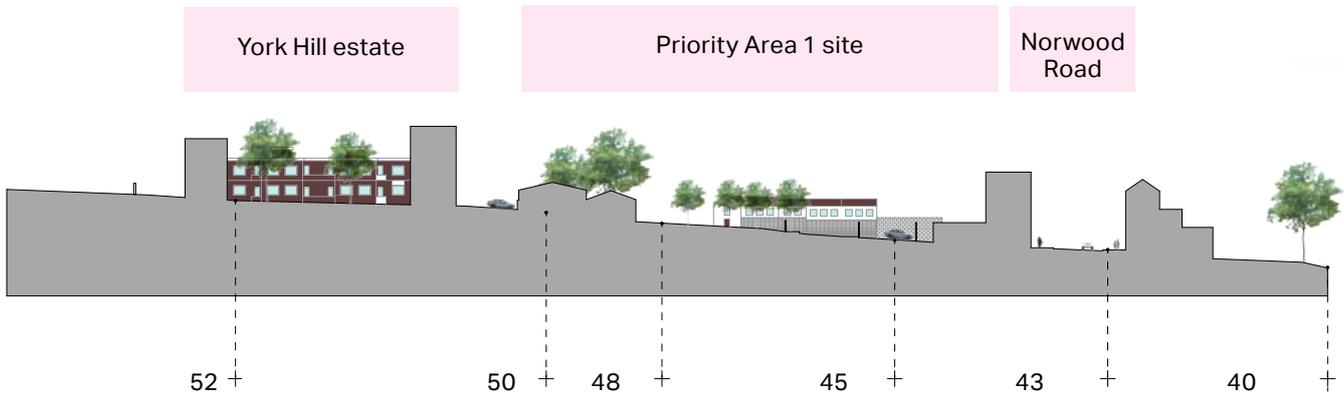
Priority Area 1: cross-section of existing site to show topography
